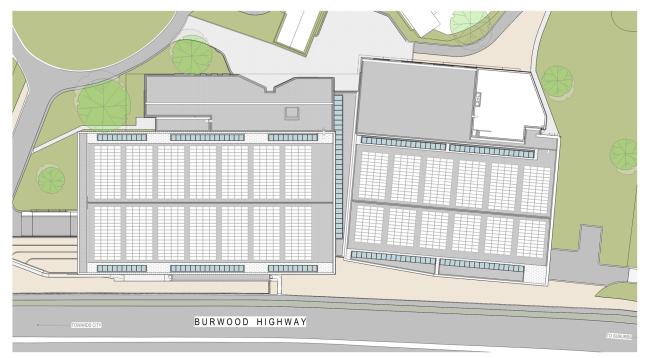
Proposed Development Plan (Source: Warren & Mahoney)
